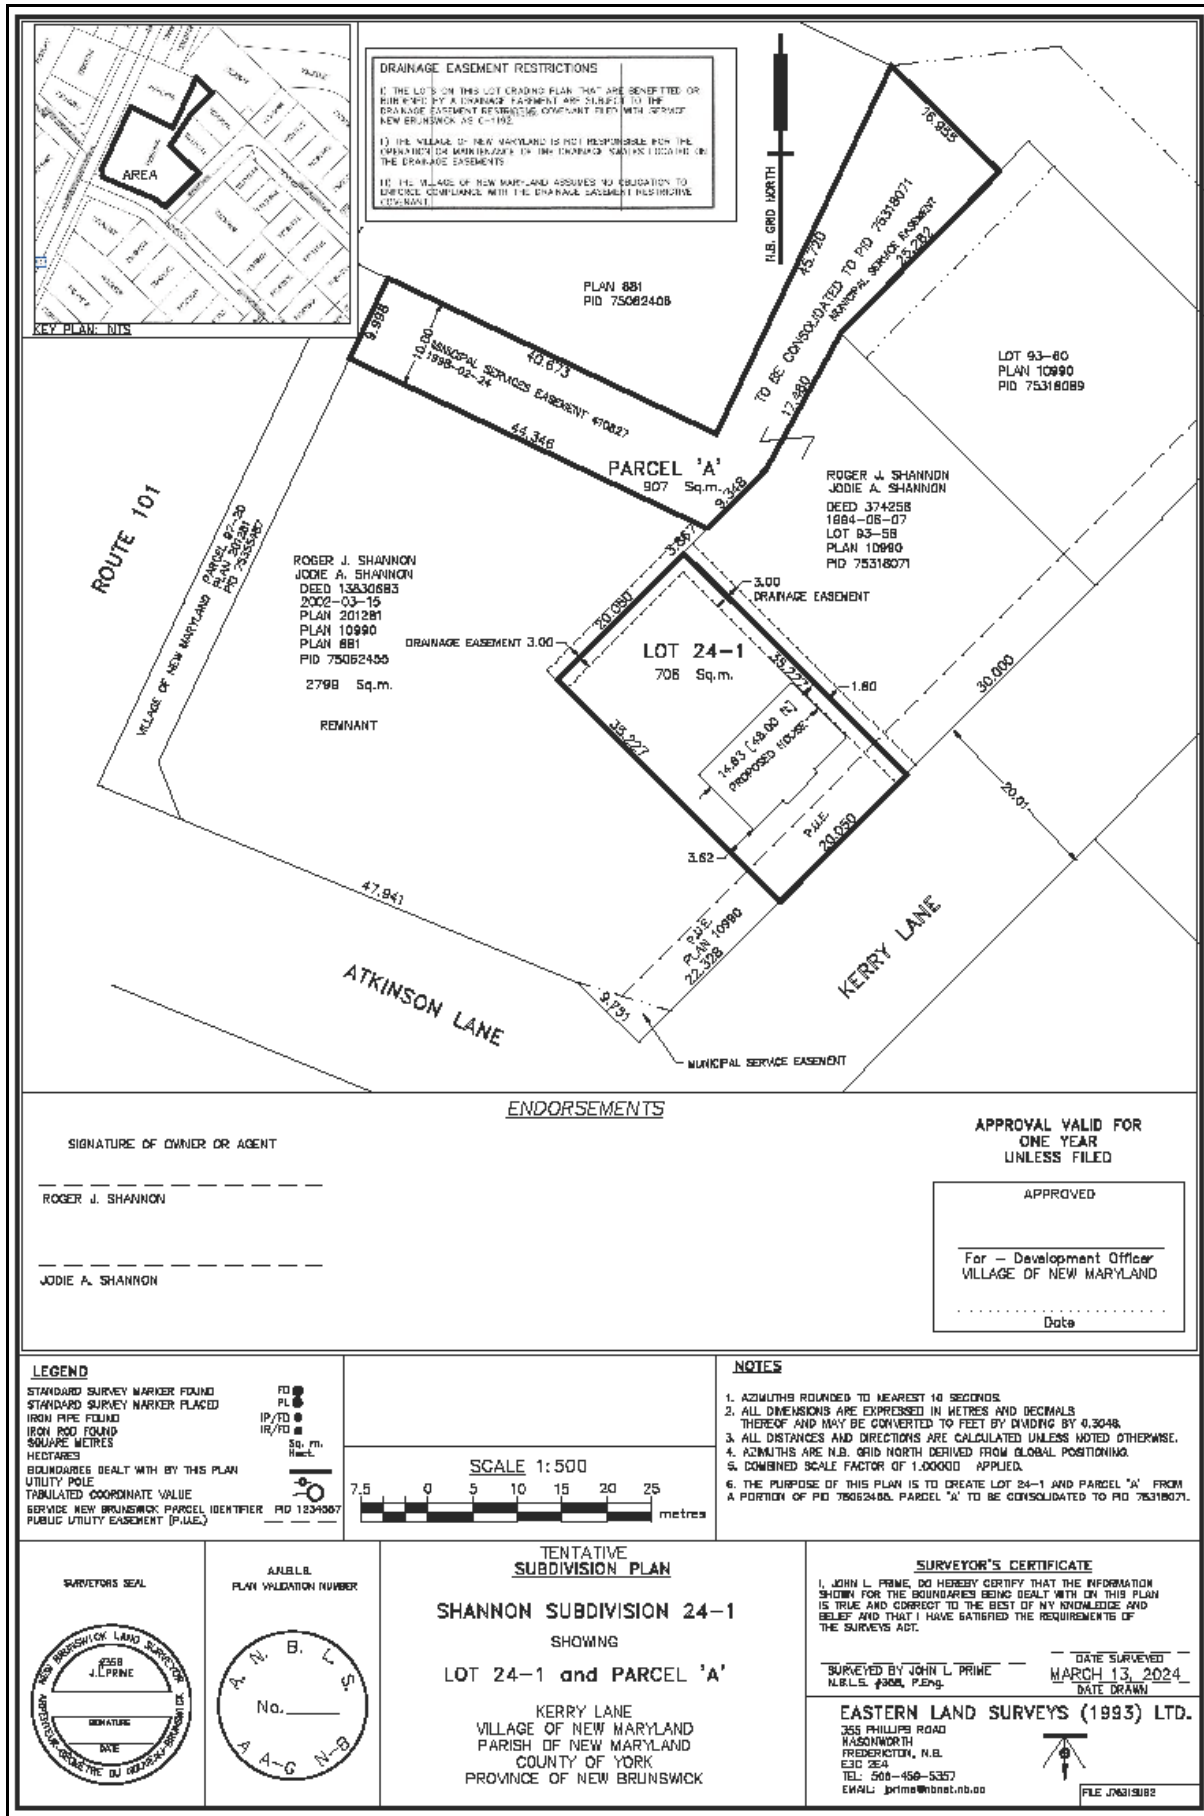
Tentative Subdivision Plan - Shannon Subdivision 24-1
